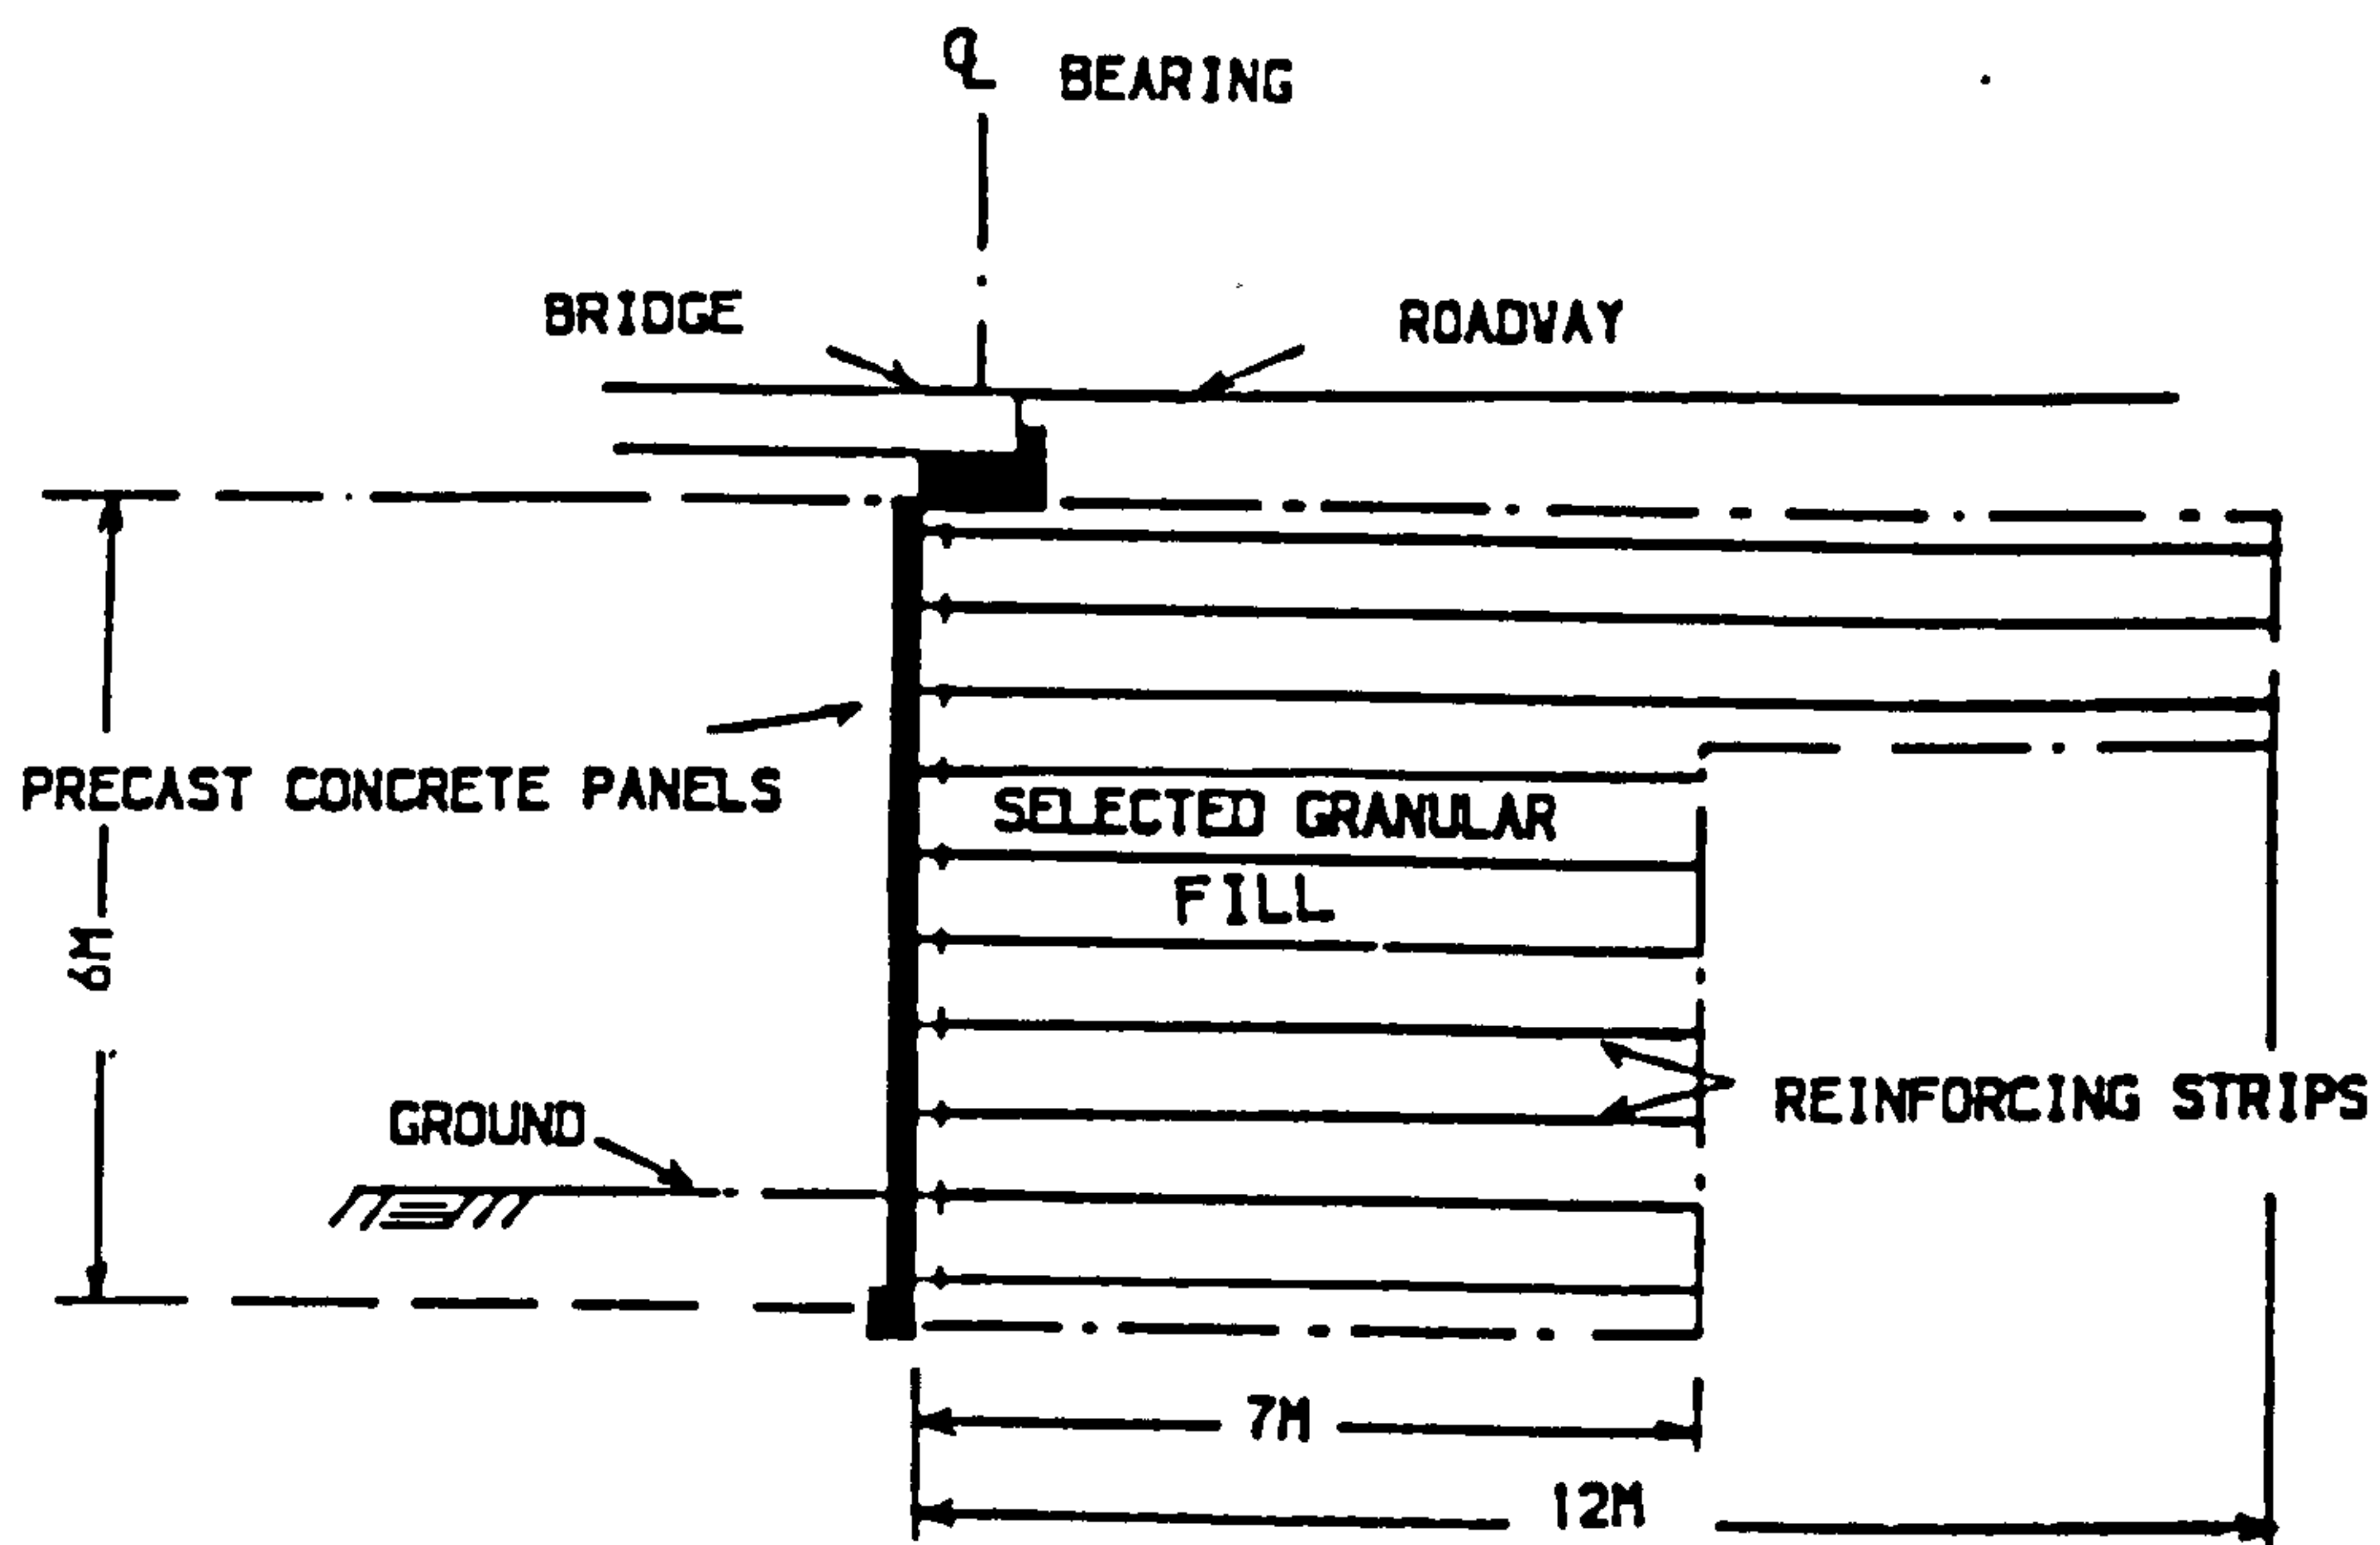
20) AN EXAMPLE OF REINFORCED EARTH ABUTMENT (AFTER GEDNEY, 1975).
